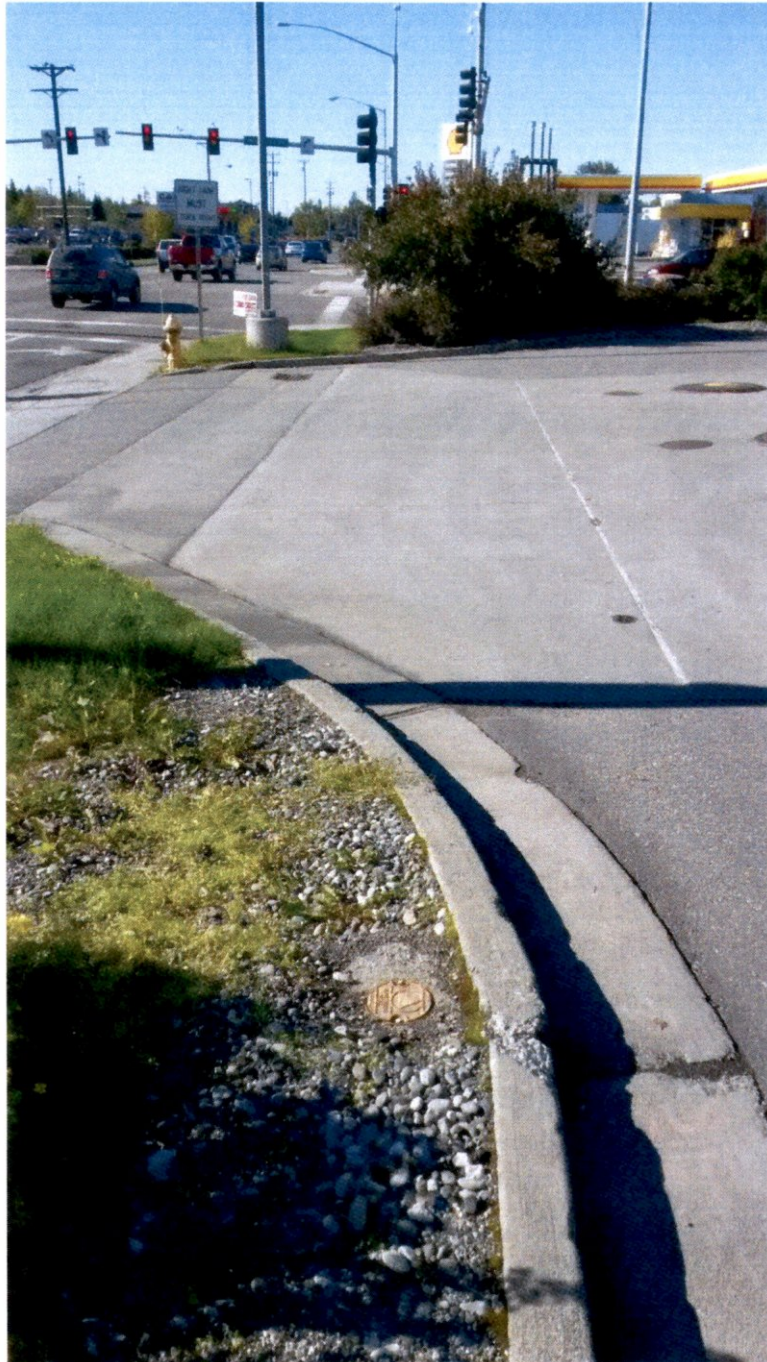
Looking west at intersection of Northern Lights Blvd and Minnesota Blvd
